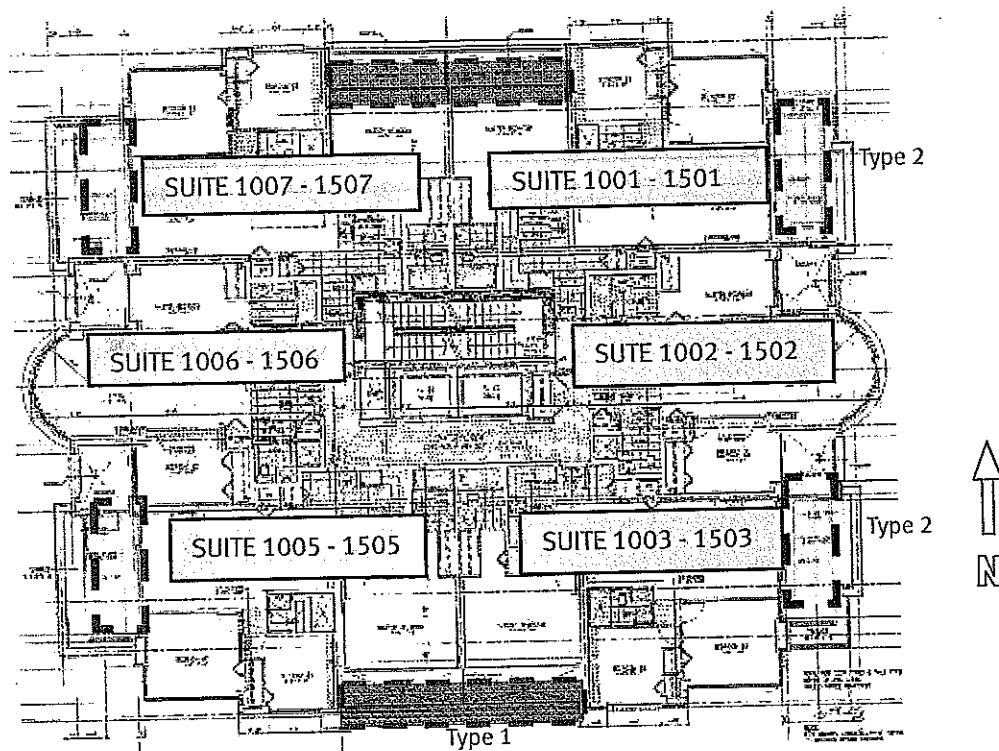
Levels 10 to 15 Floor Plans (level 13 omitted).
